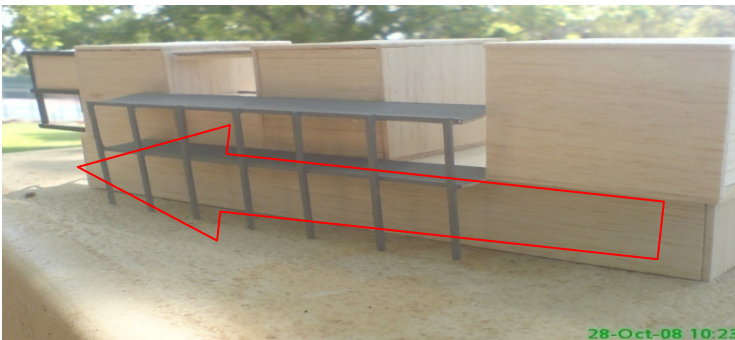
exploring the concept of circulation on first floor street level with surveillance of street and public space. Living units to be arranged around courtyards with retail on ground level.
